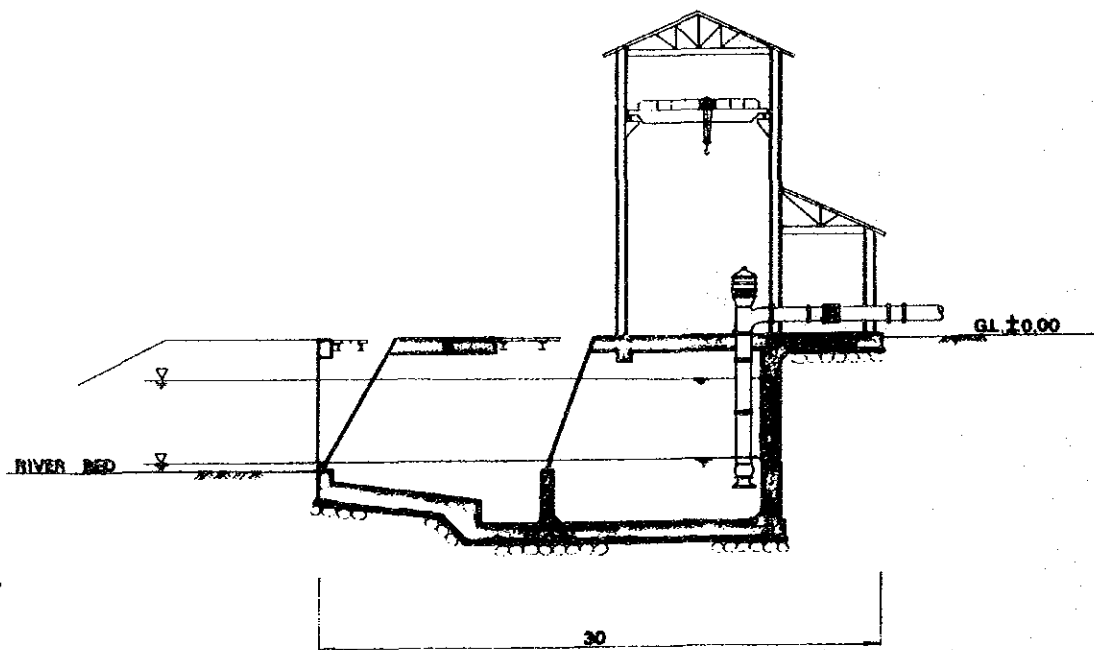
INTAKE STRUCTURE & SETTLING POND
